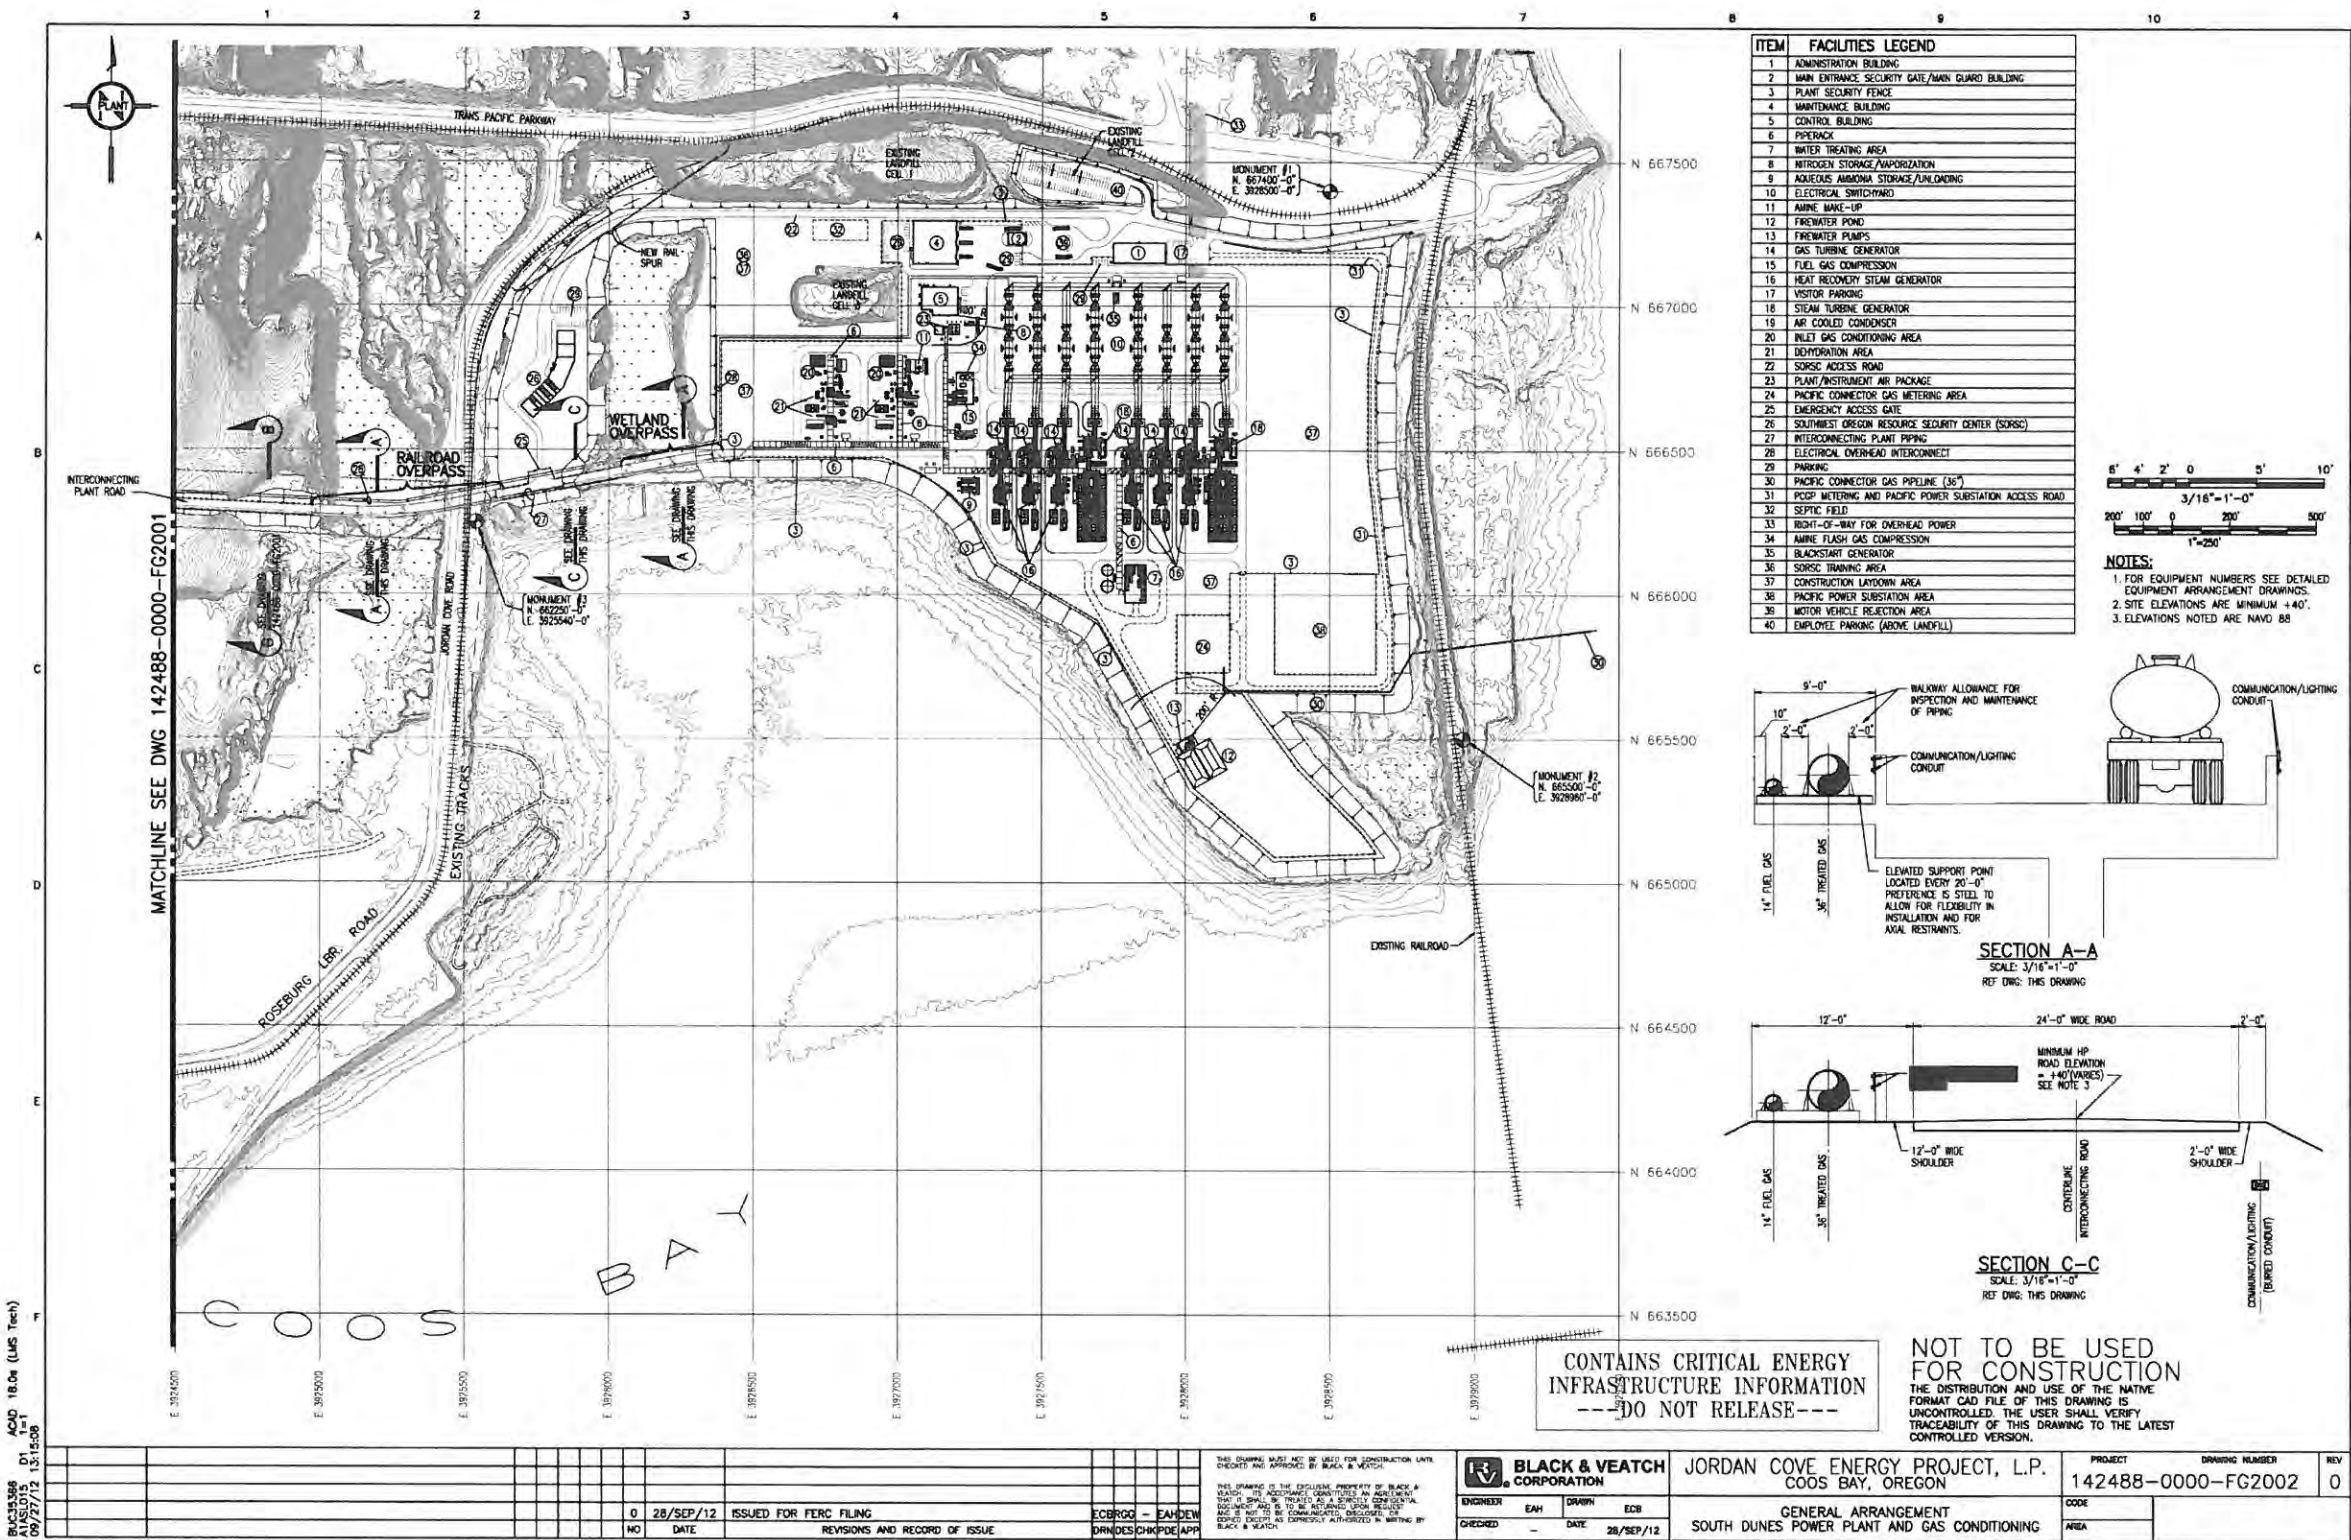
Preliminary Site Plan (Liquefaction Area)
